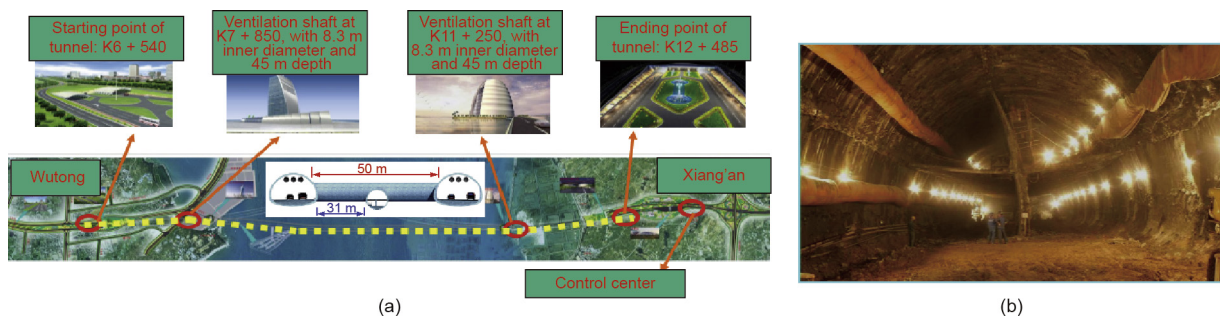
(a) Plane sketch, ventilation shafts, and excavation method for Xiang'an Tunnel in Xiamen; (b) photograph of the construction site of Xiang'an Tunnel.
